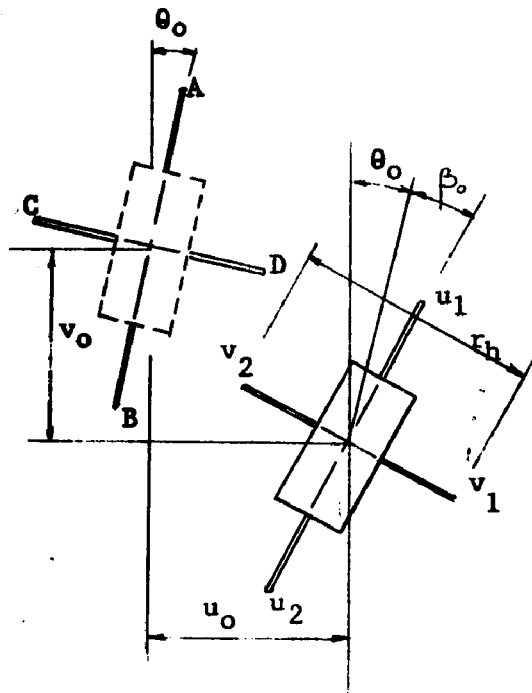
BIAXIAL BENDING TEST ASSEMBLY - II
